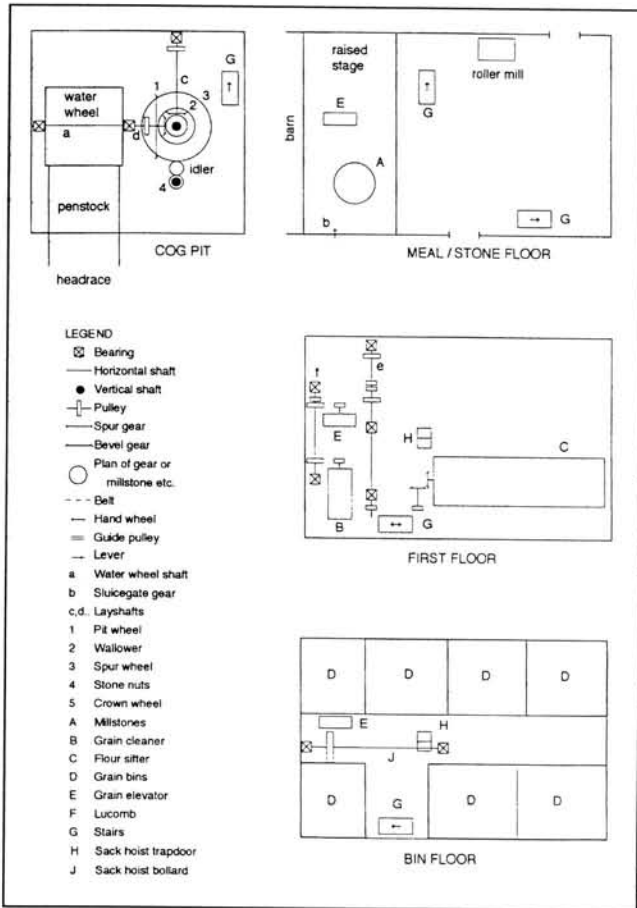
Diagram of machinery layout, Thorpe Mill.
